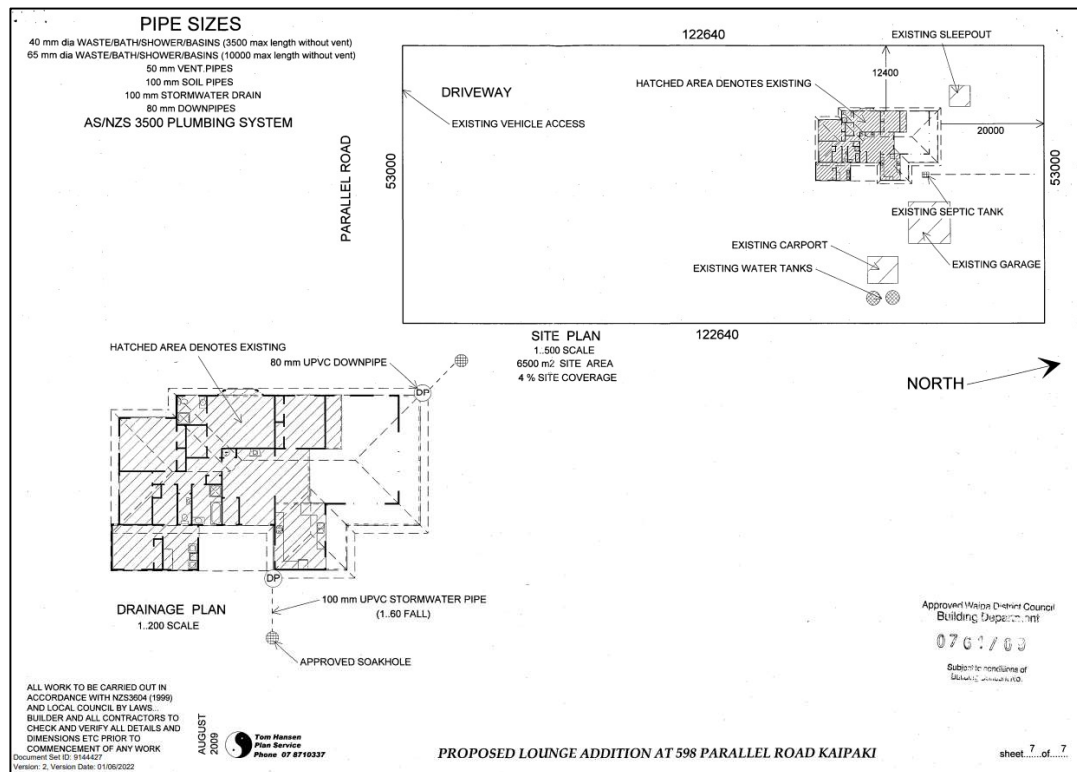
Image of plan from BC/0761 which was reused in BC/0933/16.
